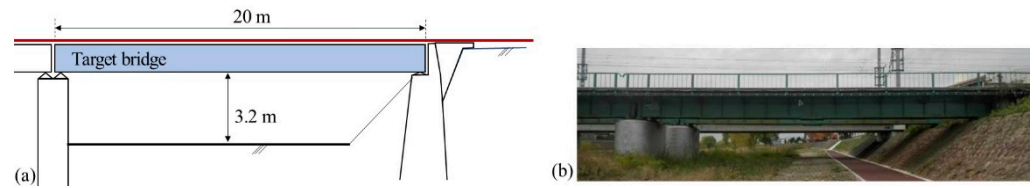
Outline of bridge A: (a) bridge span and sketch, (b) view of bridge A.
